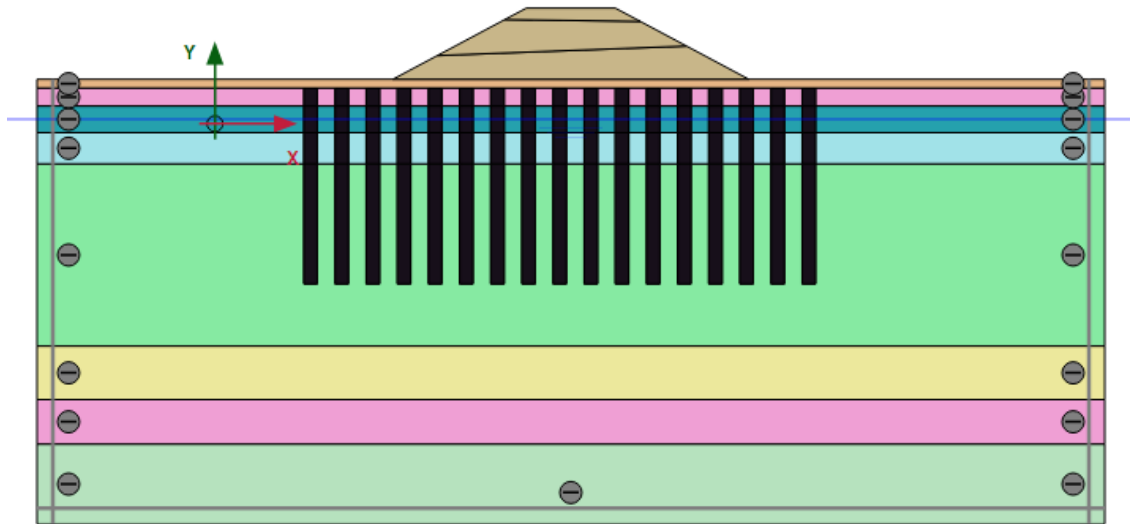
Model of embankment load on soft soil reinforced with Stone Column
